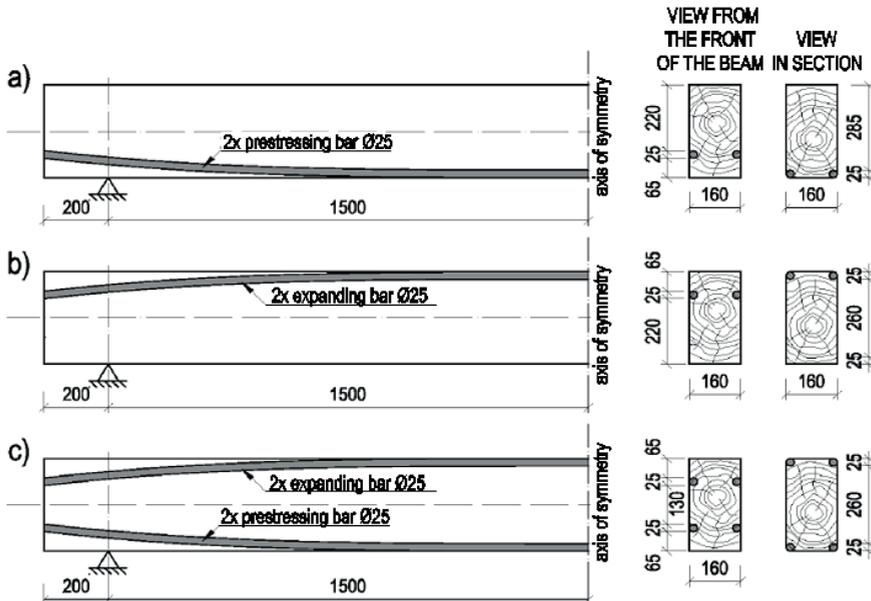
The course of the routes of prestressed and expanded bars in beams, which were examined by Cyruliński; a) prestressed beam, b) expanded beam, c) prestressed-expanded beam, [8]
